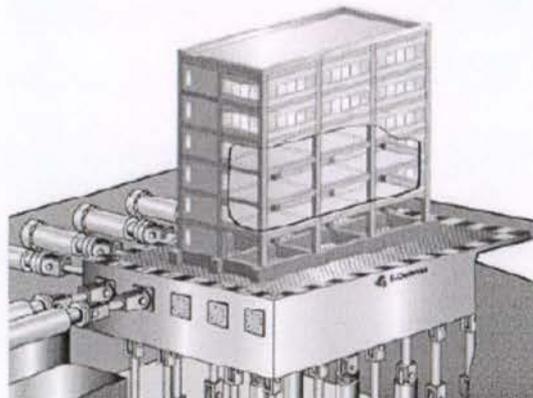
Schematic view of the reinforced concrete building on the shake table (Sato and Inoue 2004)
